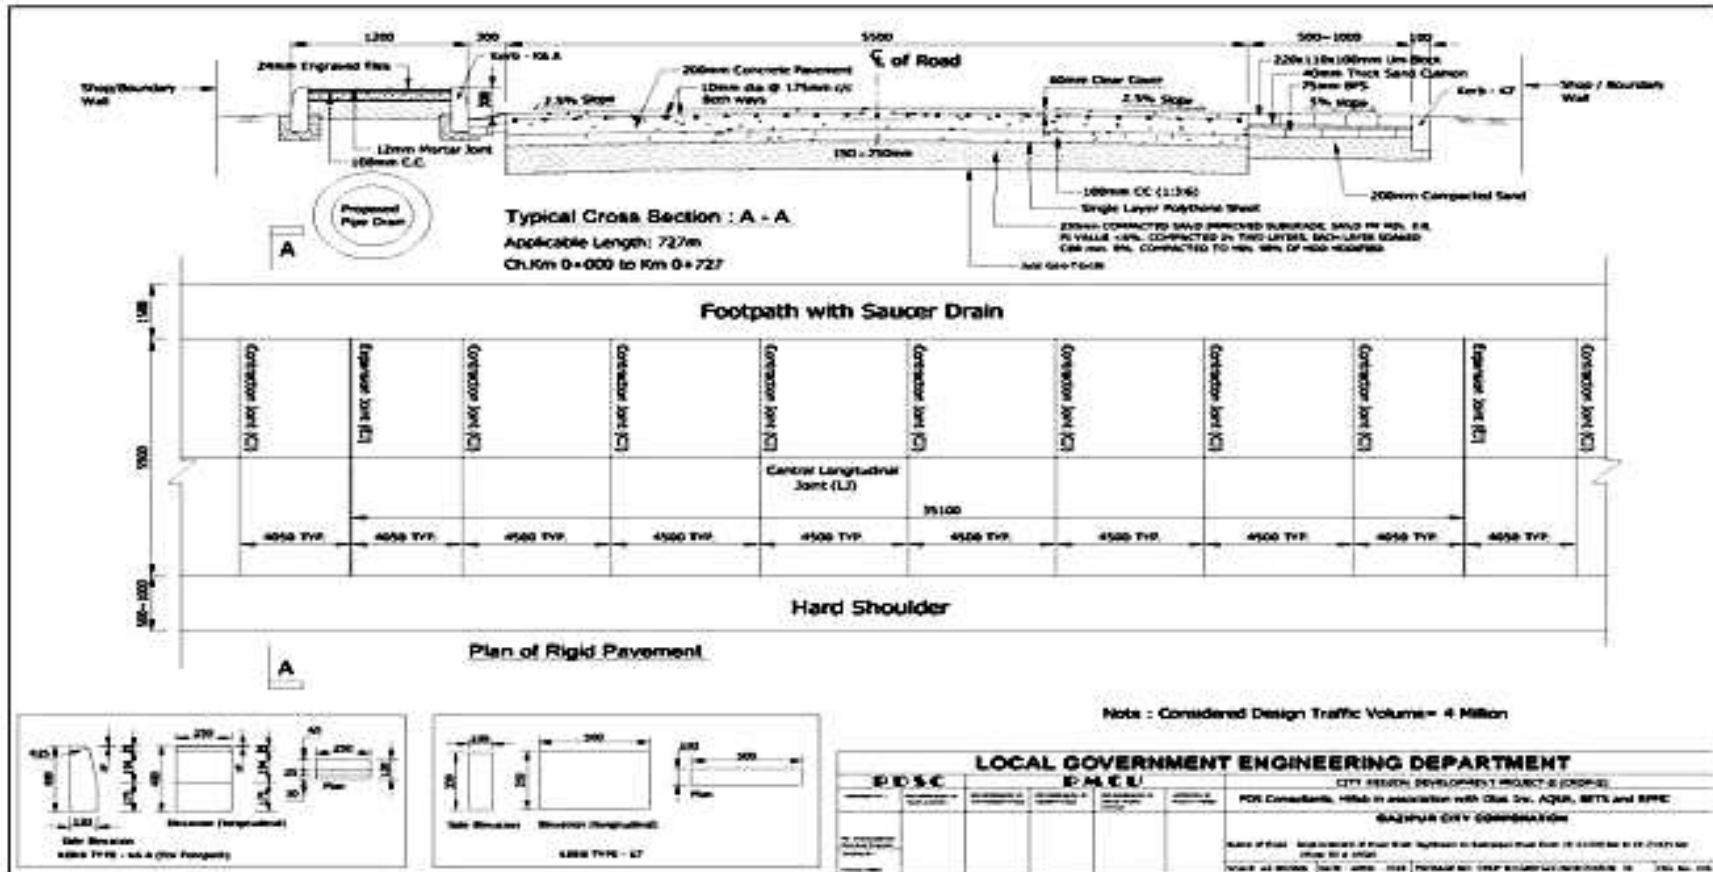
Typical cross section (Ch. 0+000 to 0+727 km)
